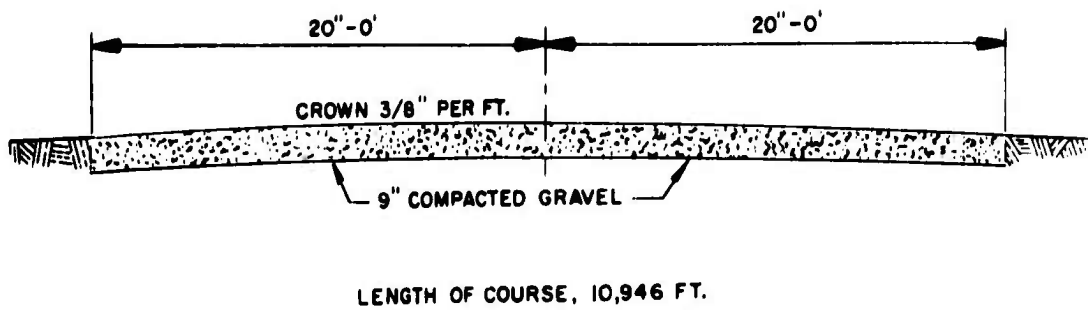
CROSS SECTION OF GRAVEL ROAD
